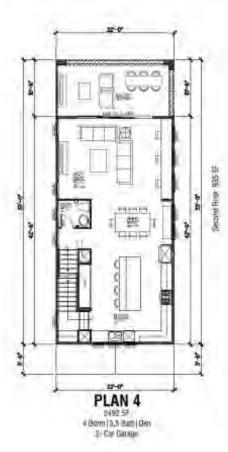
Conceptual Elevations and Floor Plans- Plan 4
